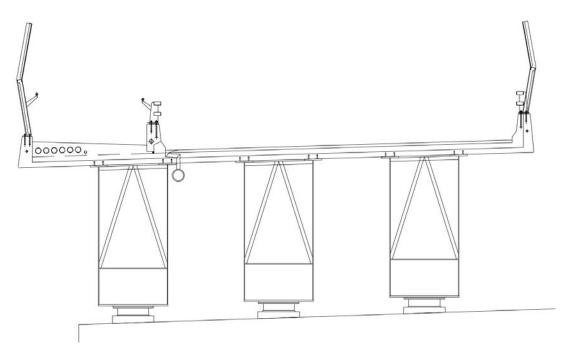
Typical Bridge Cross Section with Variable Depth Steel Girders
